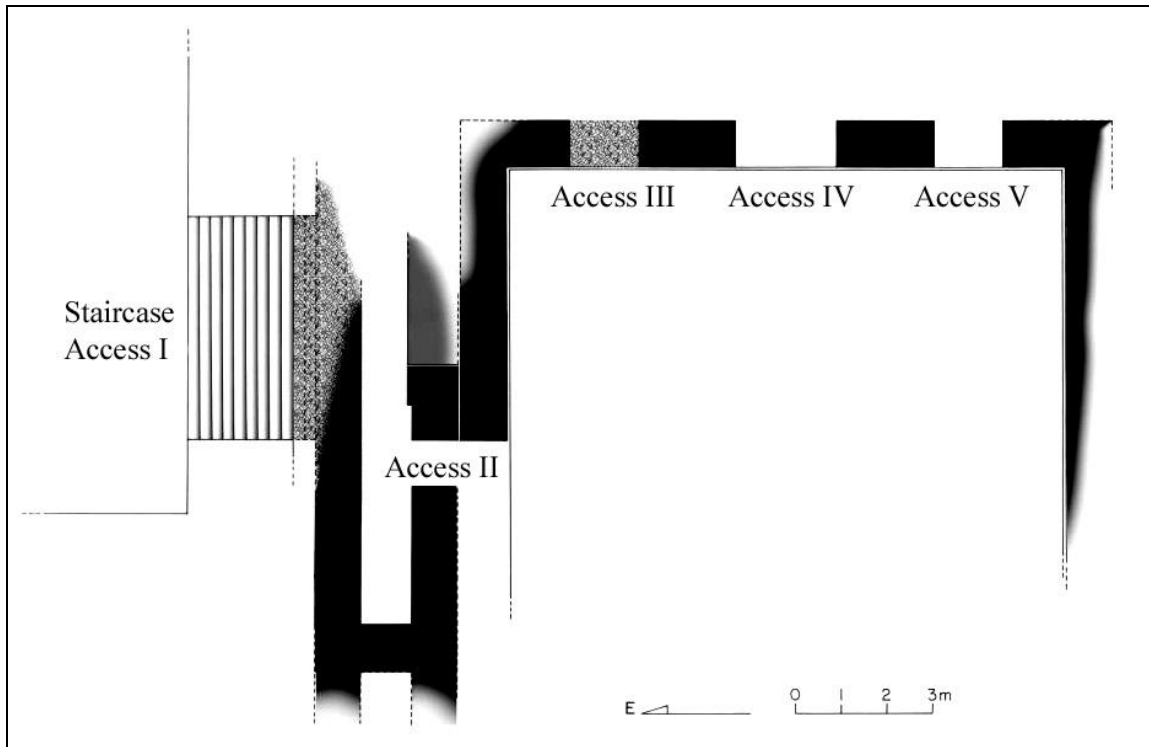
Reconstruction of internal layout, Structure L7-20 (Drawing by L. Luin, VCAP)
